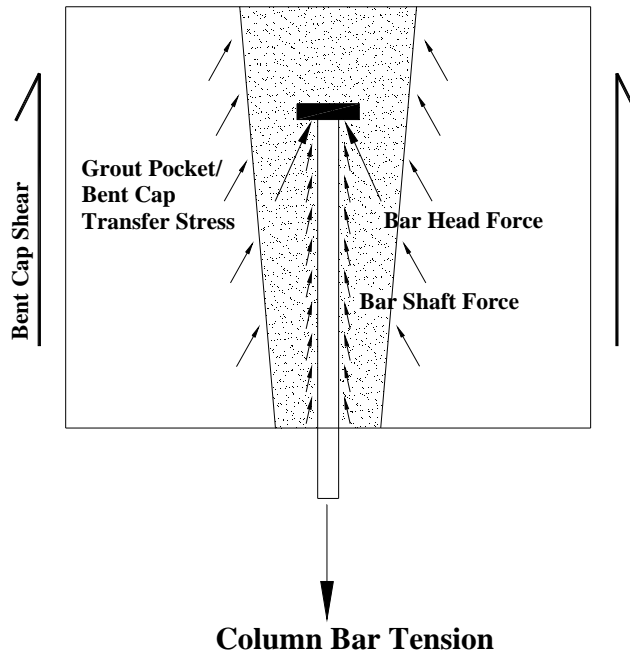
Grout Pocket Load Path (longitudinal section through cap)
